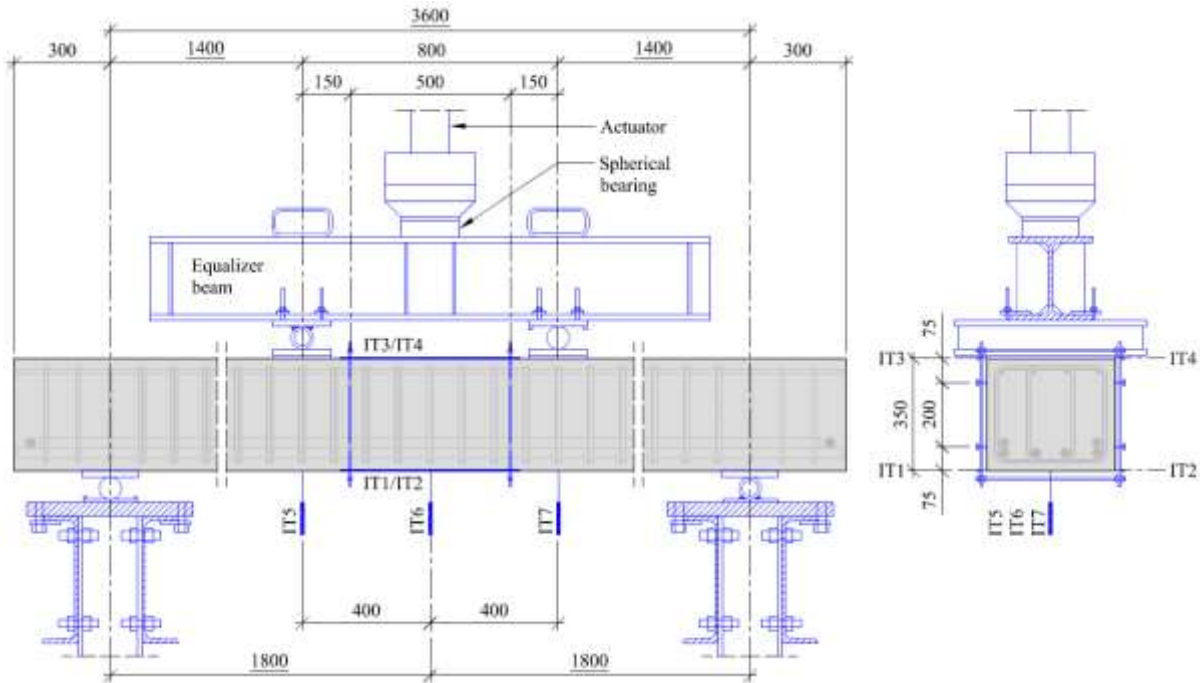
Loading arrangement and instrumentation (dimensions in mm)
